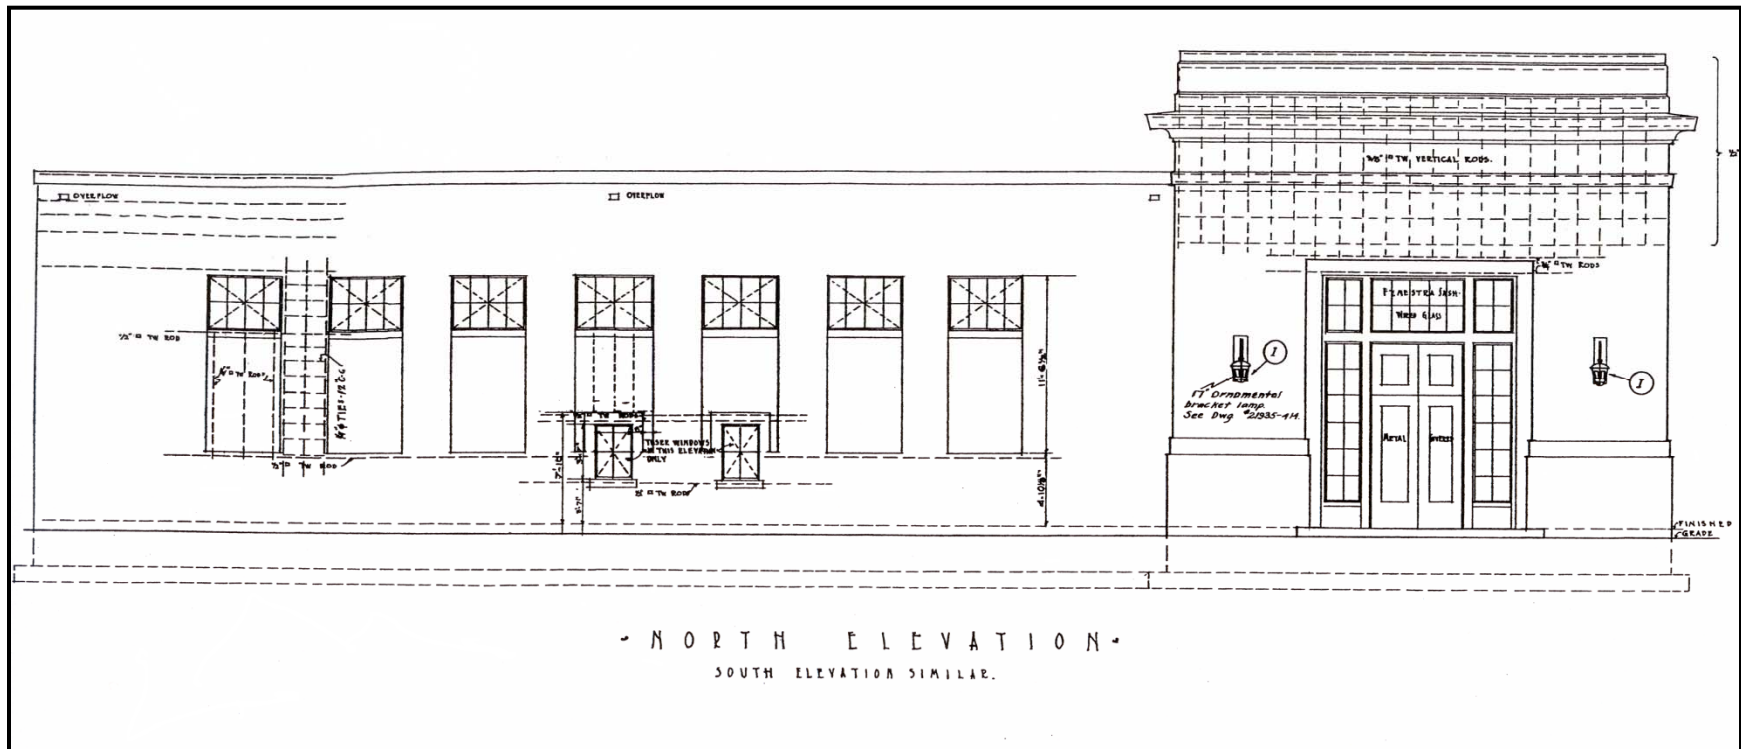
Architectural Diagram of North Elevation of Southern California Edison (San Diego Gas & Electric) Building, ca. 1917.
